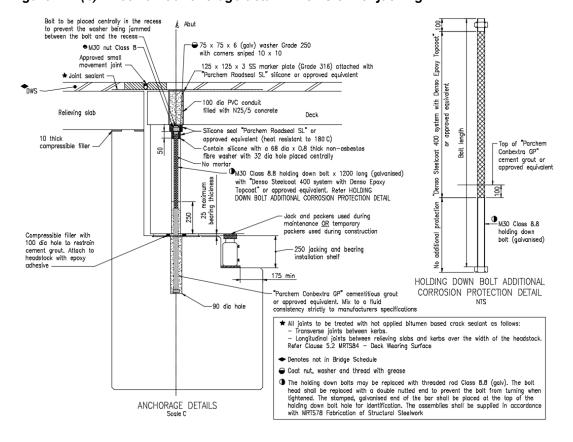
(a) - Deck unit anchorage detail - No provision for jacking
